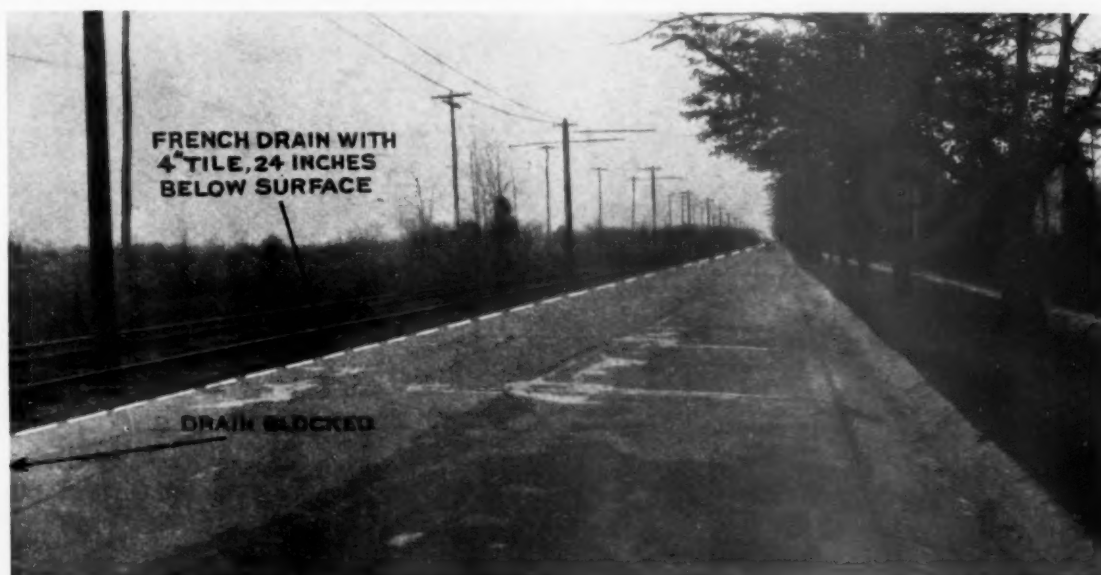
VIEW TAKEN JUST NORTH OF CYPRESS STREET AND A FEW FEET SOUTH OF THE ENTRANCE TO COLUMBIA COUNTRY CLUB. LIGHT AREAS ARE POOLS OF WATER COLLECTING ALONG CRACKS IN THE CONCRETE. DRAIN LINE WAS BLOCKED AS INDICATED
